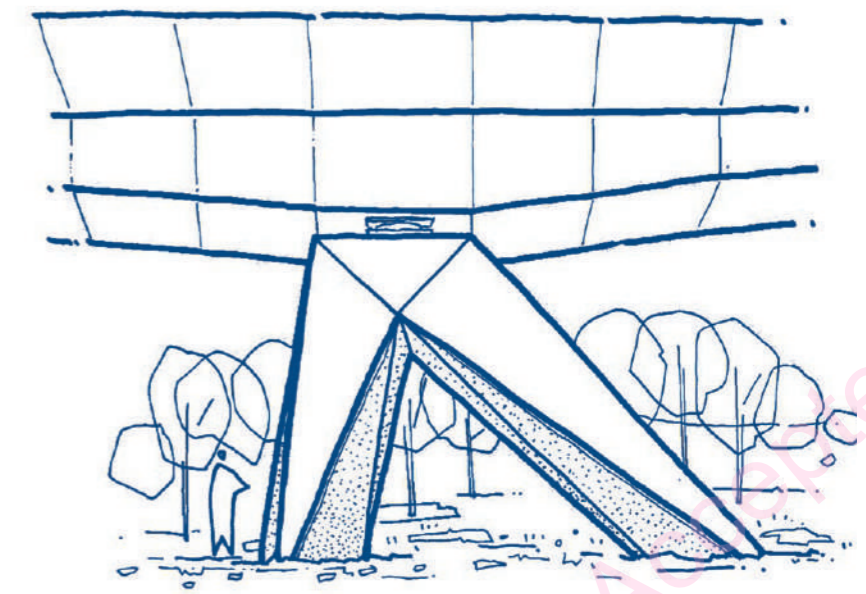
\_ Sketch - Illustrative view of fixed buttress pier
